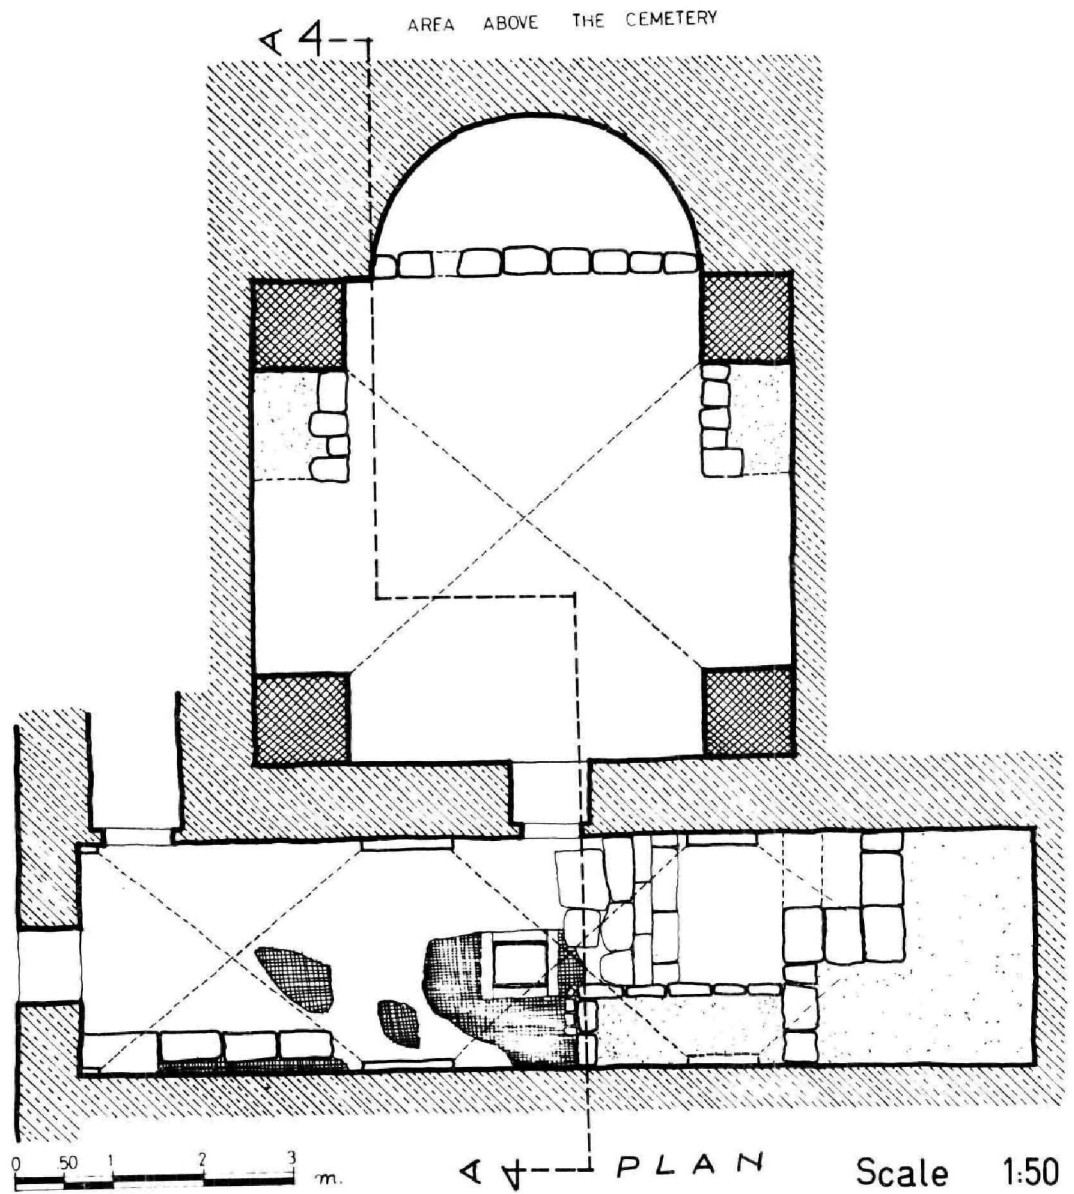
Plan of the area above the cemetery (1976-79 excavations).
